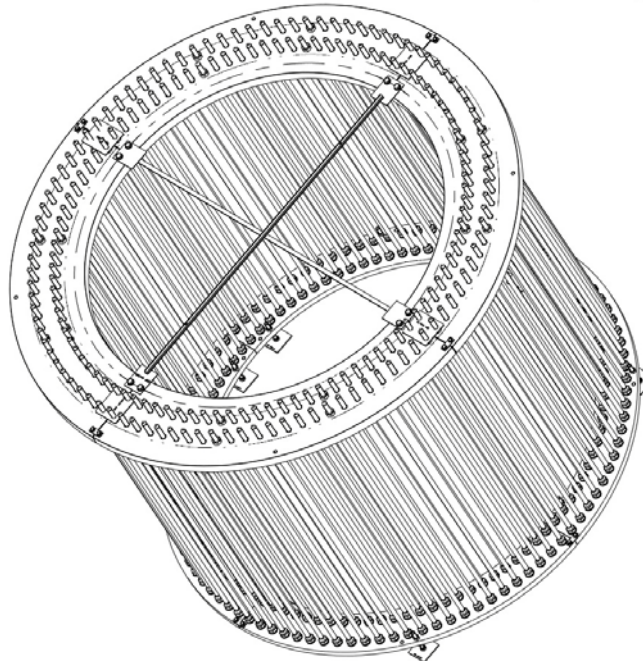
Example for an anchor cage with 4 x 50 anchor bolts
